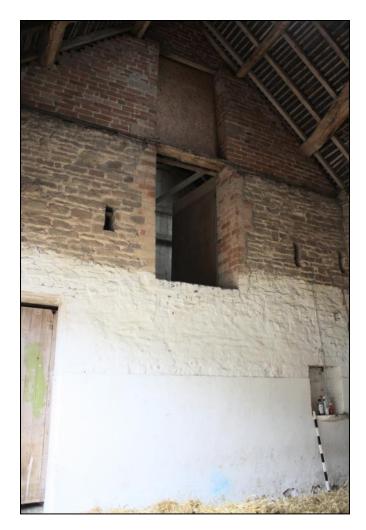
East end wall of the original part of the central range, showing three openings, gable-top brickwork and a cupboard (bottom right).
